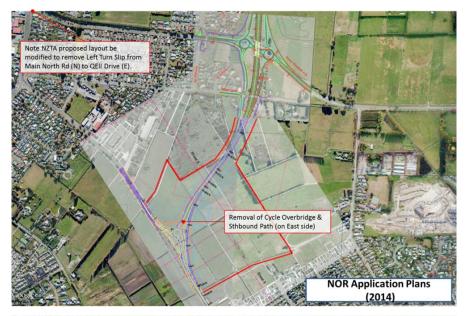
Local Changes Proposed within CNC Project Outline Plans (cf NoR)
